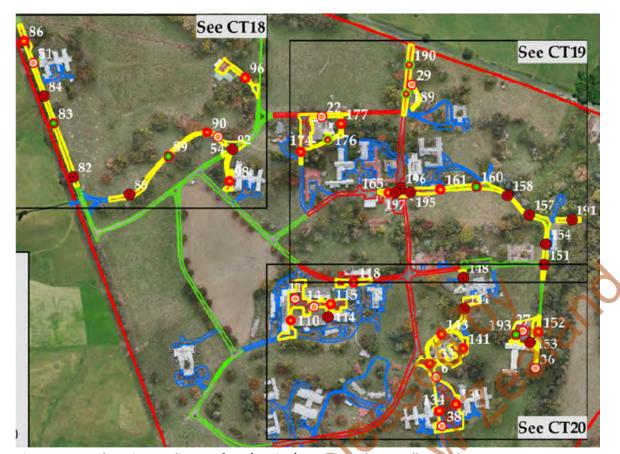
Coal Tar in Roading Surface (Paving) Location Plan – yellow polygons
